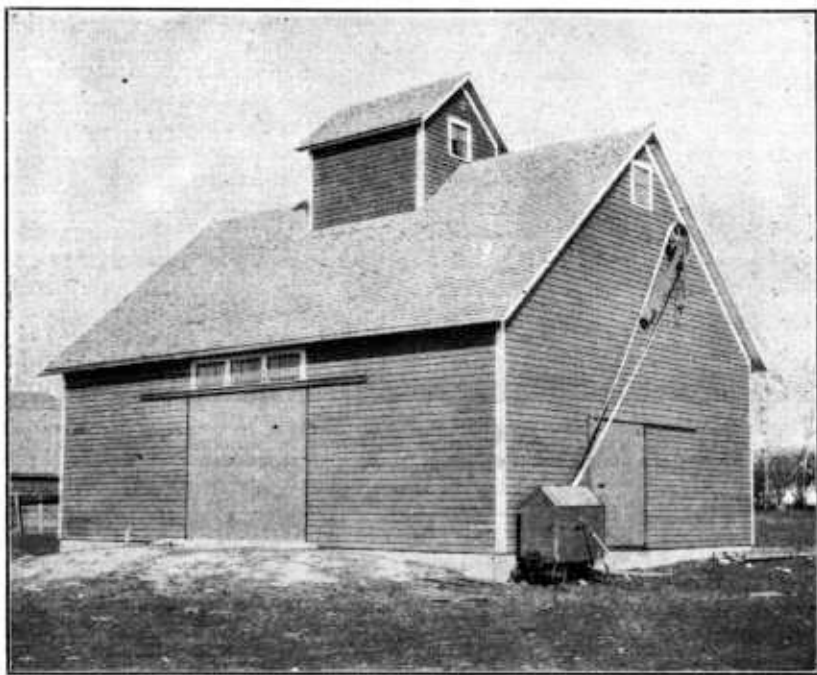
A farm elevator 26 by 38 by 12 feet, balloon framing. Bins are filled by means of an inside cup elevator, driven by a portable engine, which may also be used to drive a feed grinder by belting through the door. Windows over the driveway door light the interior permitting inside work during bad weather
